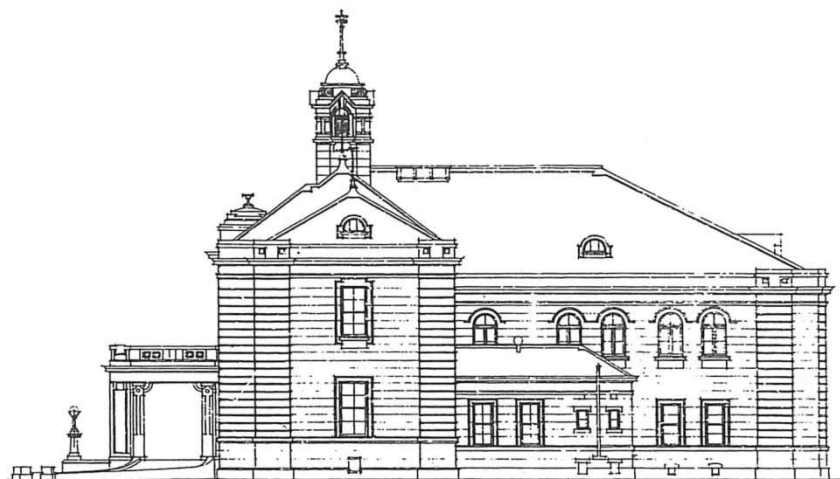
Elevation of east side in 1916, when the Assembly Building was constructed (side)
